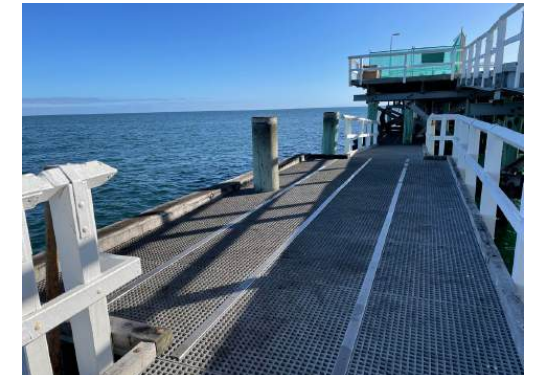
View of low platform with FRP decking, Section 7, Busselton Jetty. H+H Architects, 2022.
